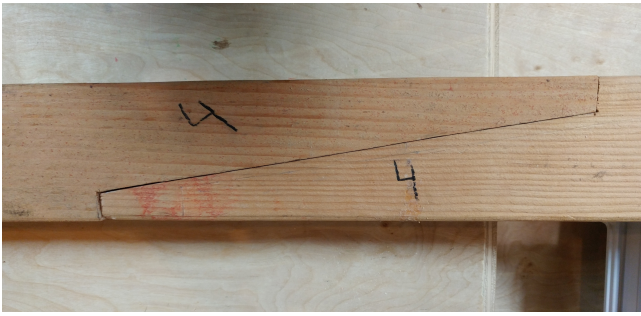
A well fitted scarf joint helps make a longer timber out of shorter pieces or repair damage
